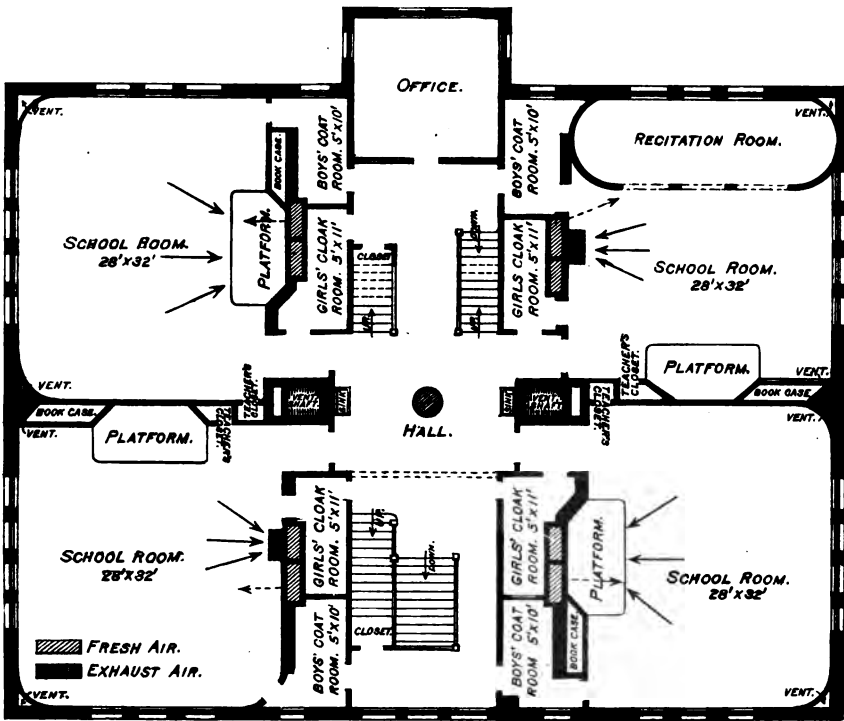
Concord Square school, Somerville, Mass. (First floor plan.)
